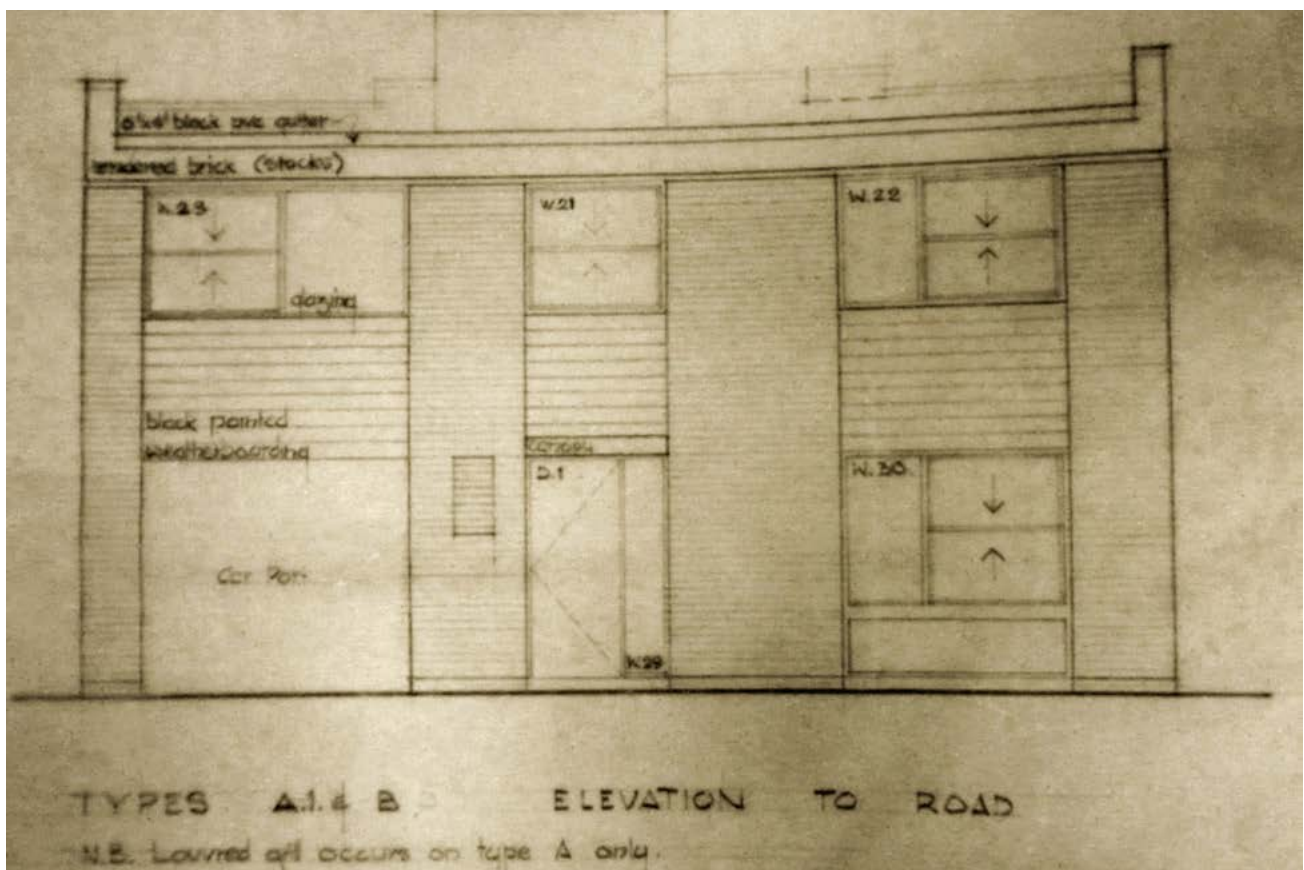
Elevation of House Type A and B, 1967 Dennis Lennon & Partners. London Metropolitan Archive
